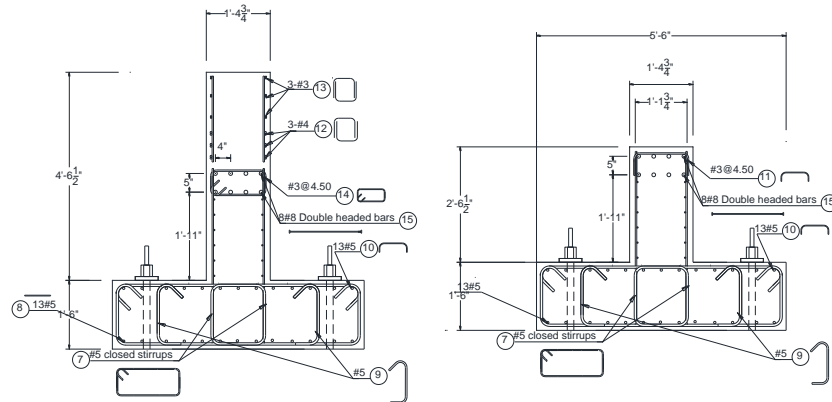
Section E-E (left) and F-F (right) in design drawings for Specimens 8 and 10 (see Figure 6.1 for the location of the sections)
